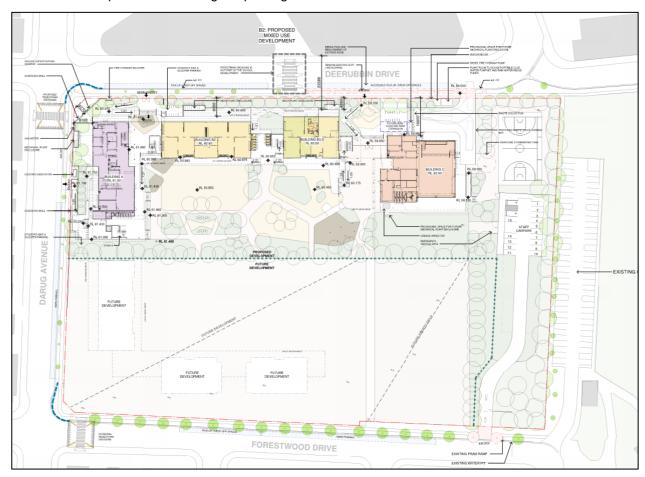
Source is Site Plan - 20415-NBRS-DR-A-SSDA-0110 Rev 8
